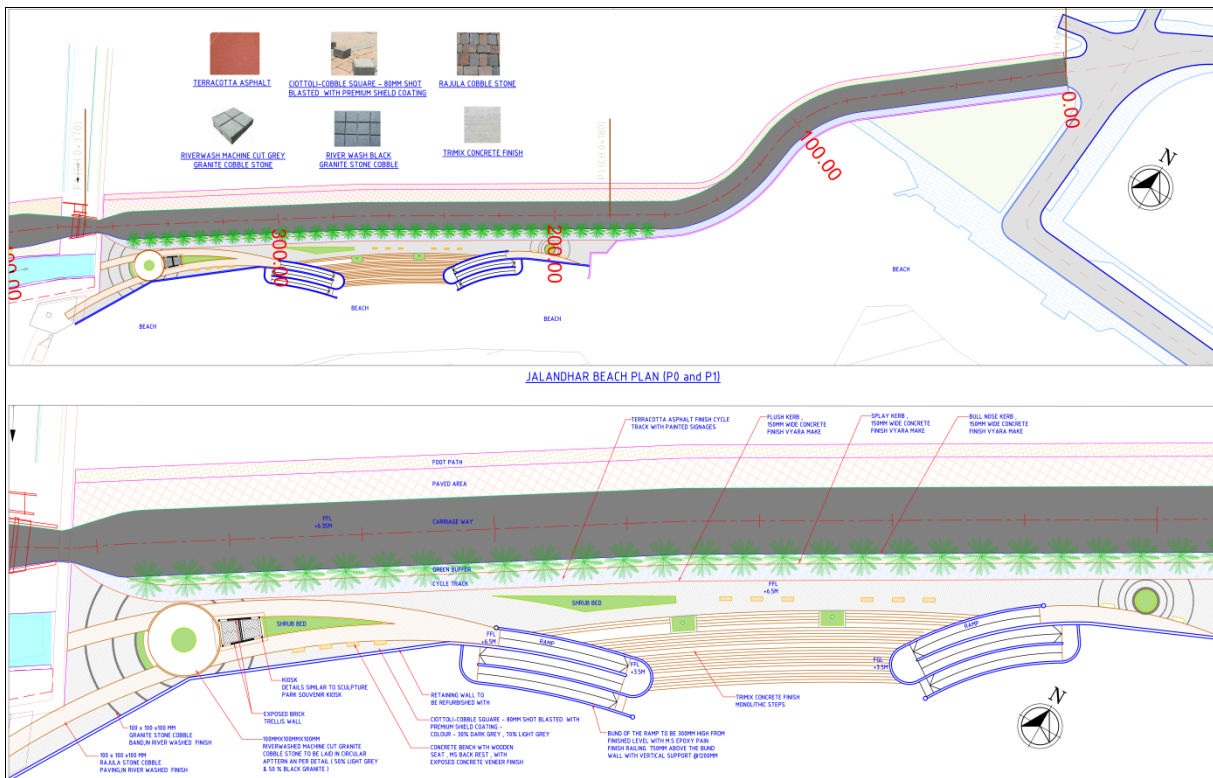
Development Plan from Summer house to City wall – Stretch 2
